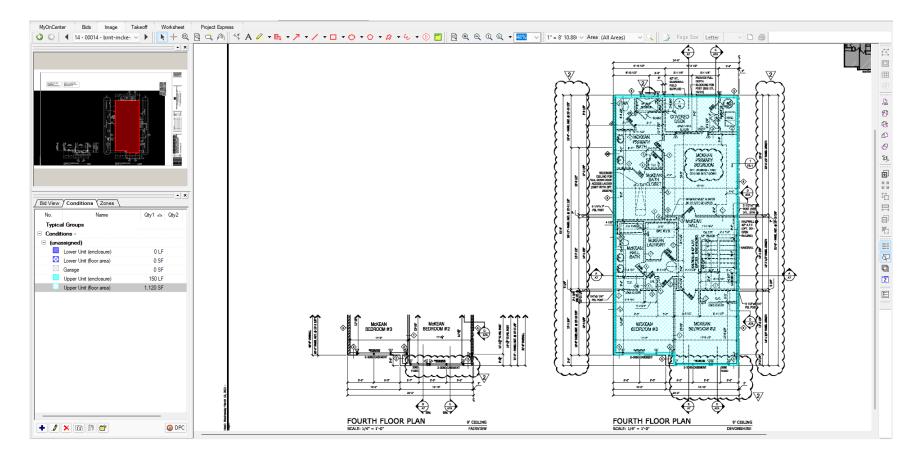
Site-built test unit floor plans, level 4 (project 3)
